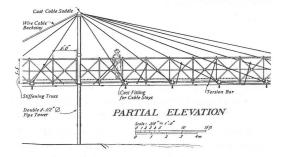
Bluff Dale Bridge with metal truss of 1899 (HAER TX–36, sheet 3; Erick McEvoy, delineator)
